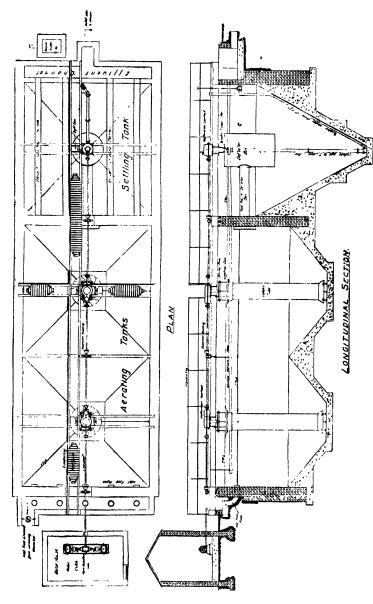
Enlarged plan and section of 'Simplex' settling and aerating tanks.
